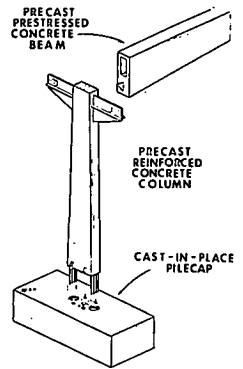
Structural details of Disney monorail guideway (all dimensions in in.).
